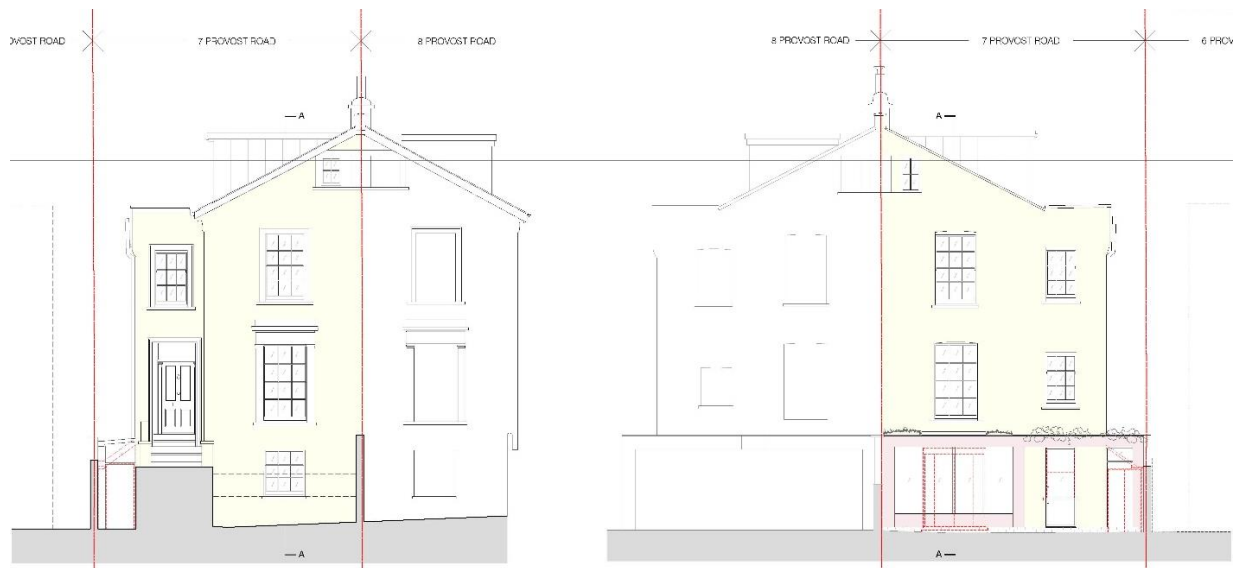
& fig.28 front elevation & rear elevation with proposed extension
